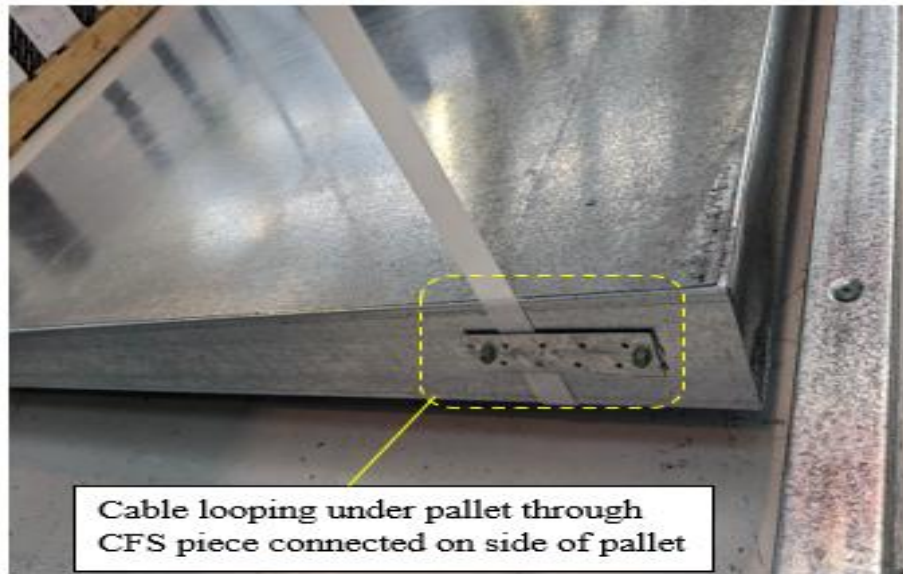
Loaded pallets hanging from CFS Box Sections
